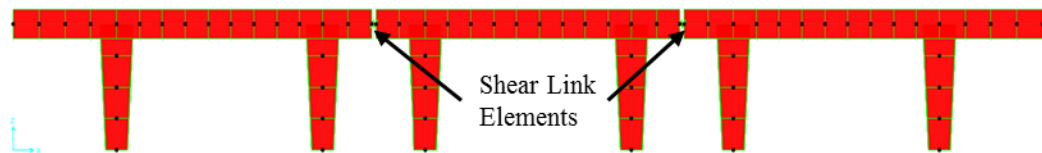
Finite Element Cross-Section, shell joint pattern at stems
